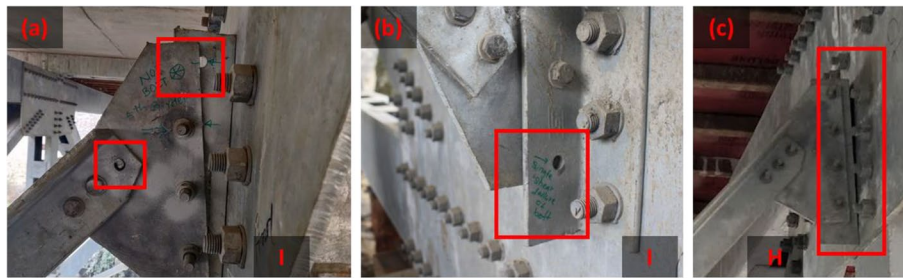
Connection damage in vertical bracing: a at the top connection with middle truss at joint I of the vertical bracing between the middle and right trusses, b at the bottom connection with the right truss at joint I of the vertical bracing between middle and right trusses, c at the top connection with middle truss at joint H of the vertical bracing between the middle and the right trusses
